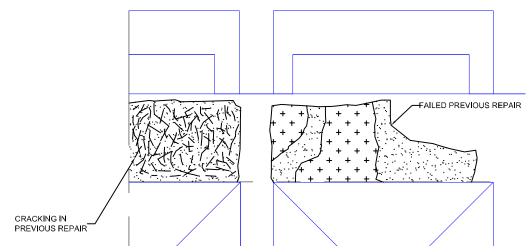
Cracking and Spalling Above Shield Doors at HSM-45 and HSM-46
